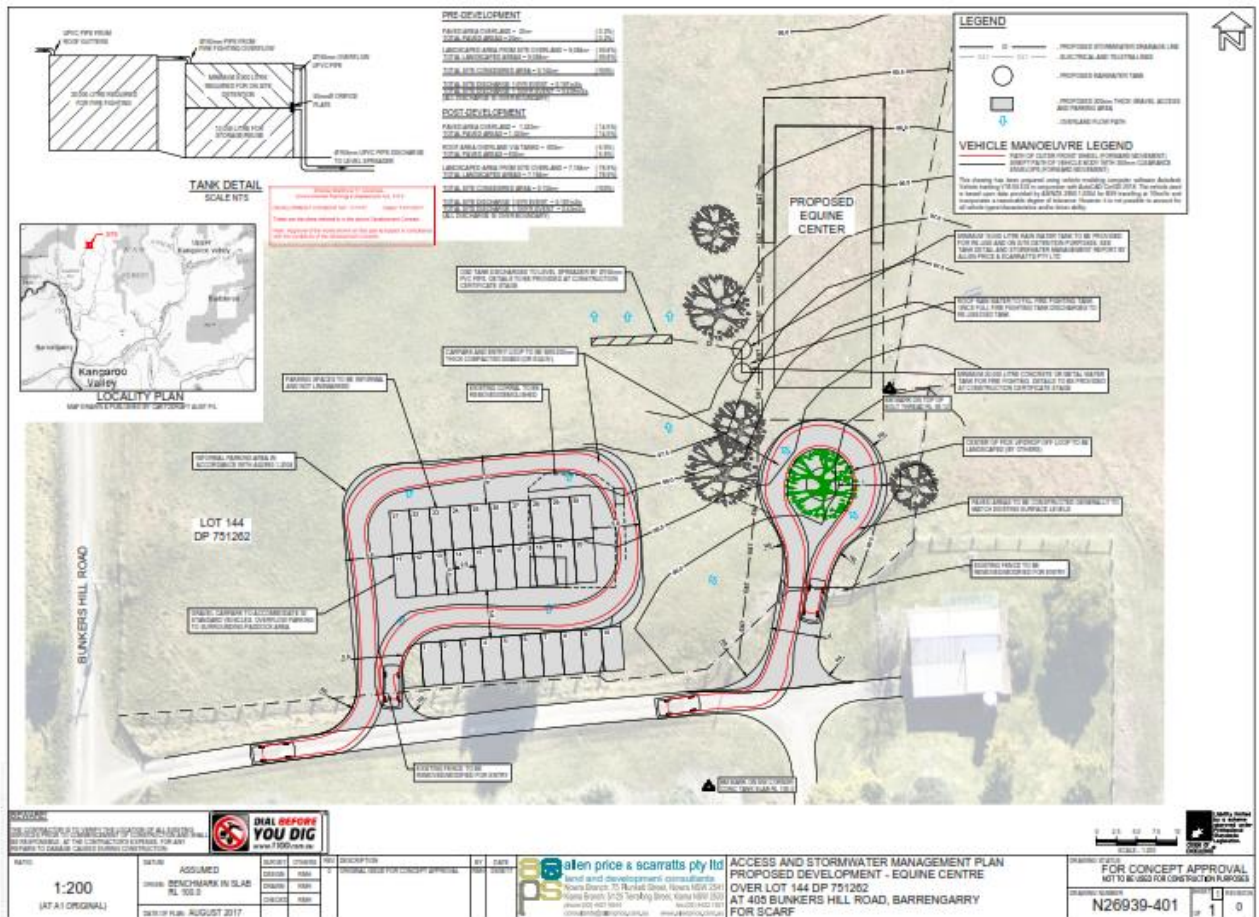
Approved Site Plan of Equine Centre from DA17/1157
